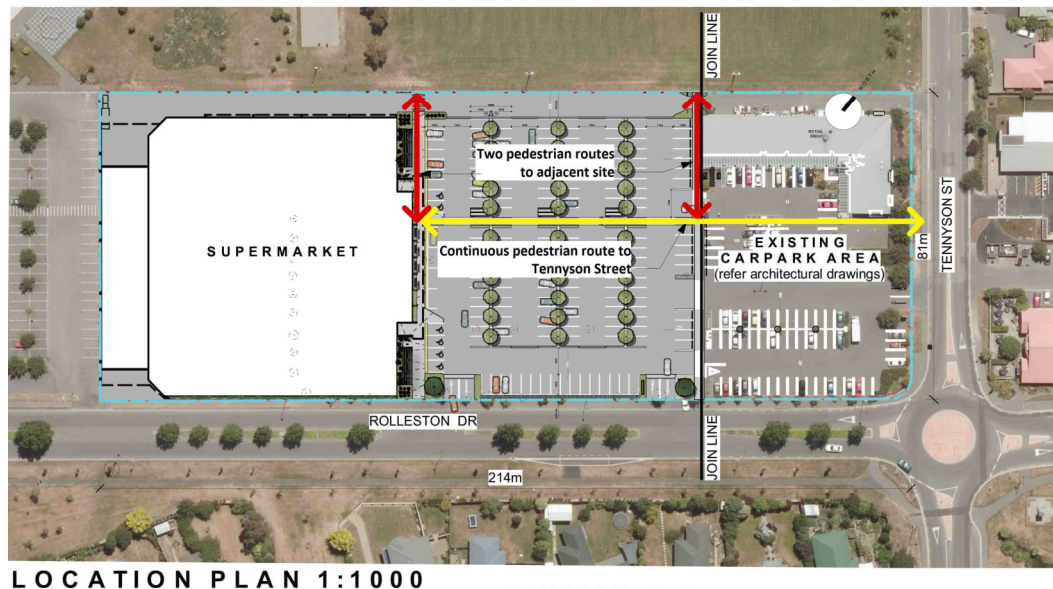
Location and Elevation Plans along Rolleston Drive consented Pak'n'Save
